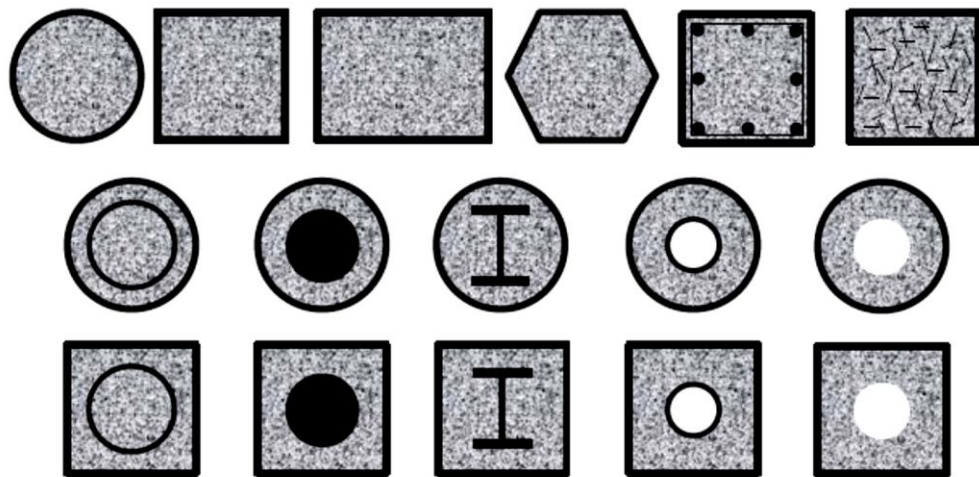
Types of concrete filled steel tubular cross sections (Liew and Xiong, 2015)
